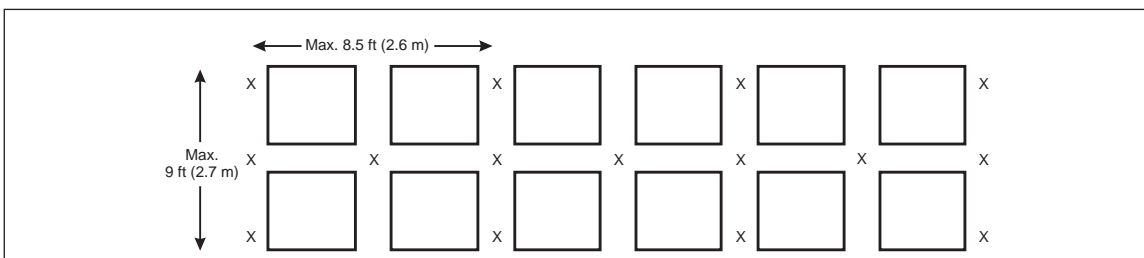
Plan view of alternative in-rack sprinkler arrangement for double-row racks up to 9 ft (2.7 m) deep
